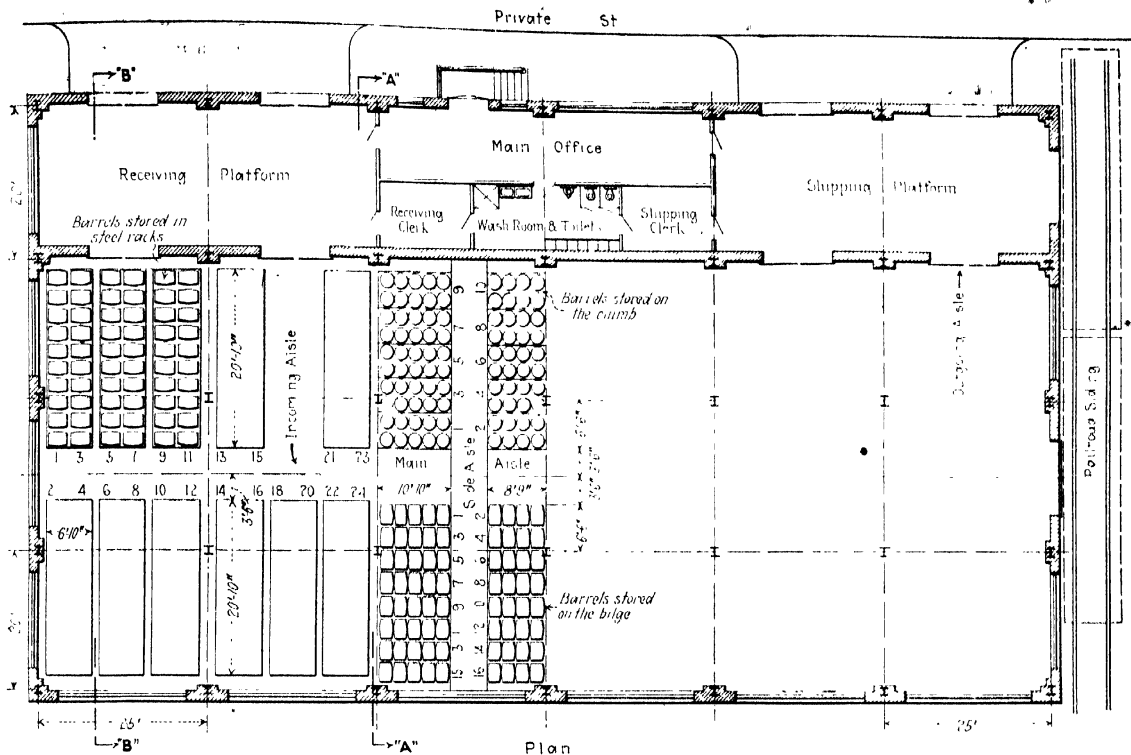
PLAN SHOWING LAYOUT OF BARREL STORAGE
